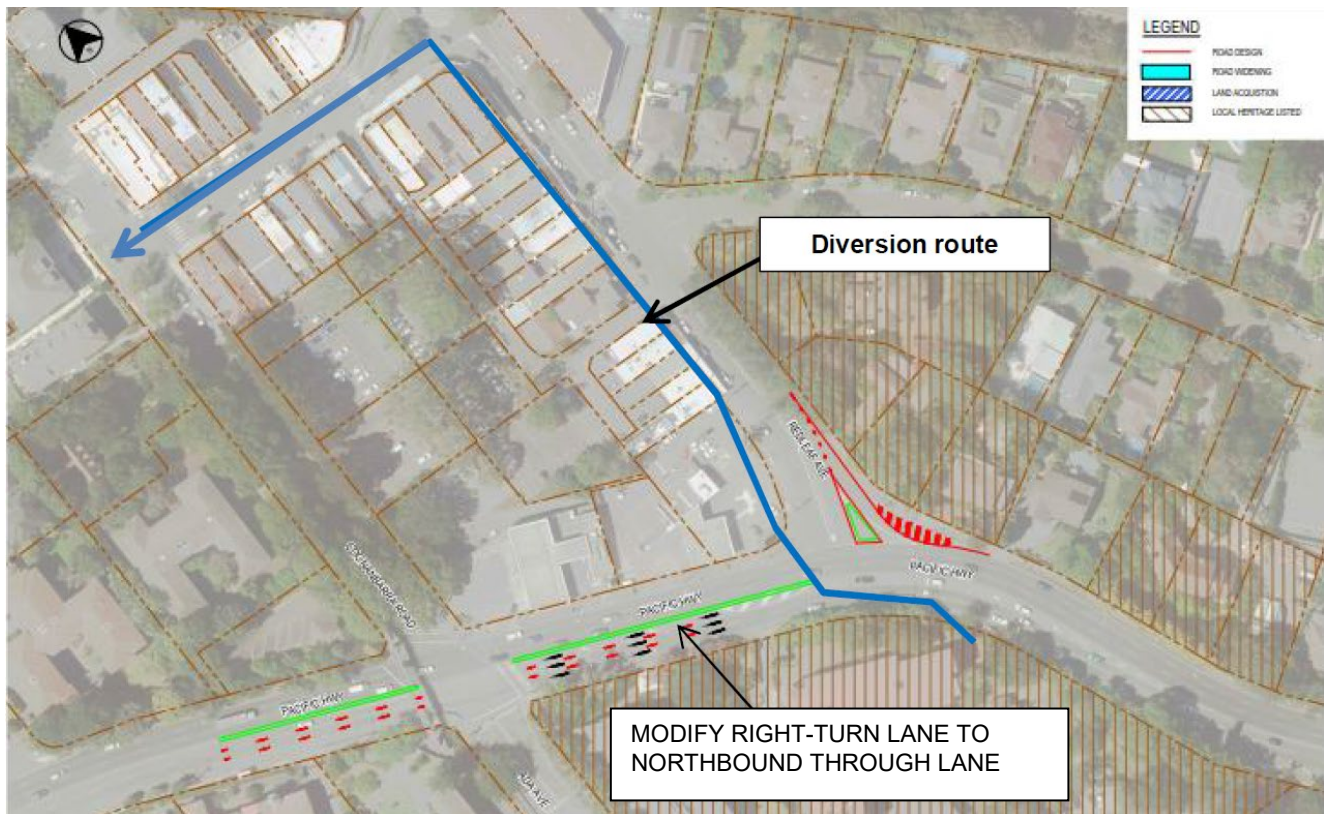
Option B Layout: Modifying existing lane configuration on approach to Coonanbarra Road (Roads and Maritime, 2017a)
